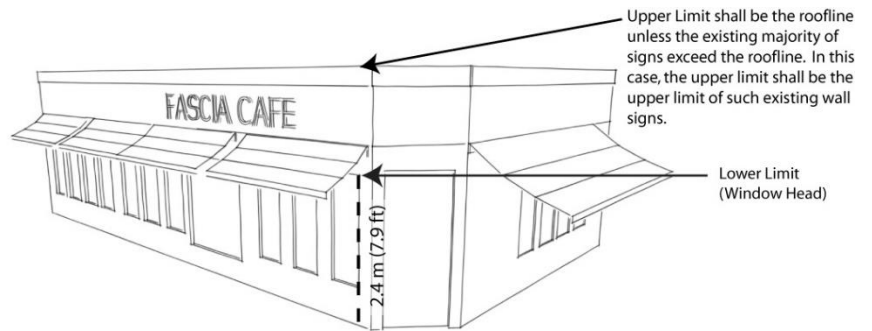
FASCIA SIGN PLACEMENT, ONE STOREY BUILDING
